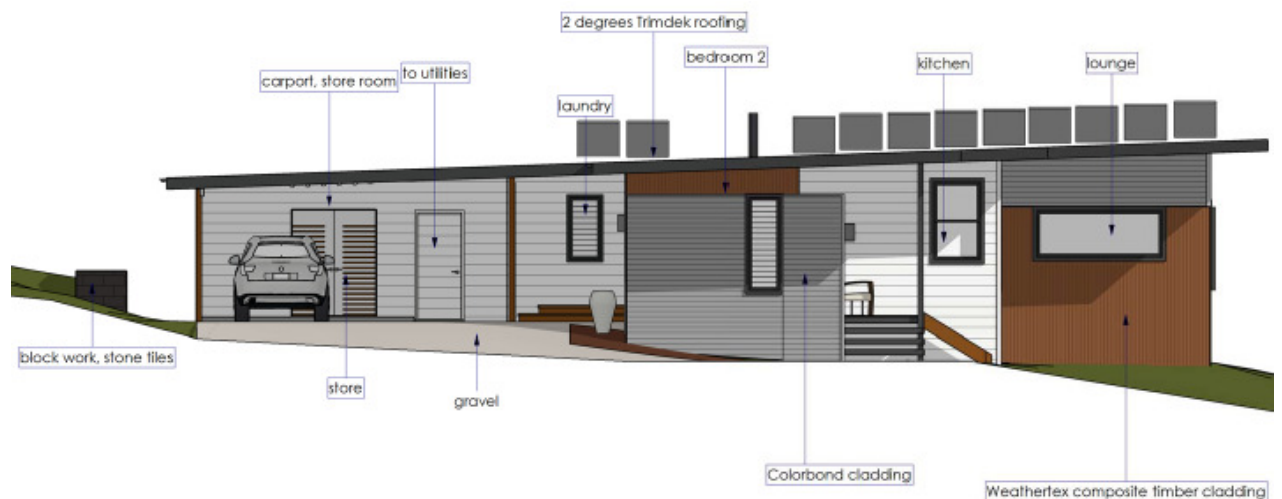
Southern elevation of proposed building (EXPANDesign)
